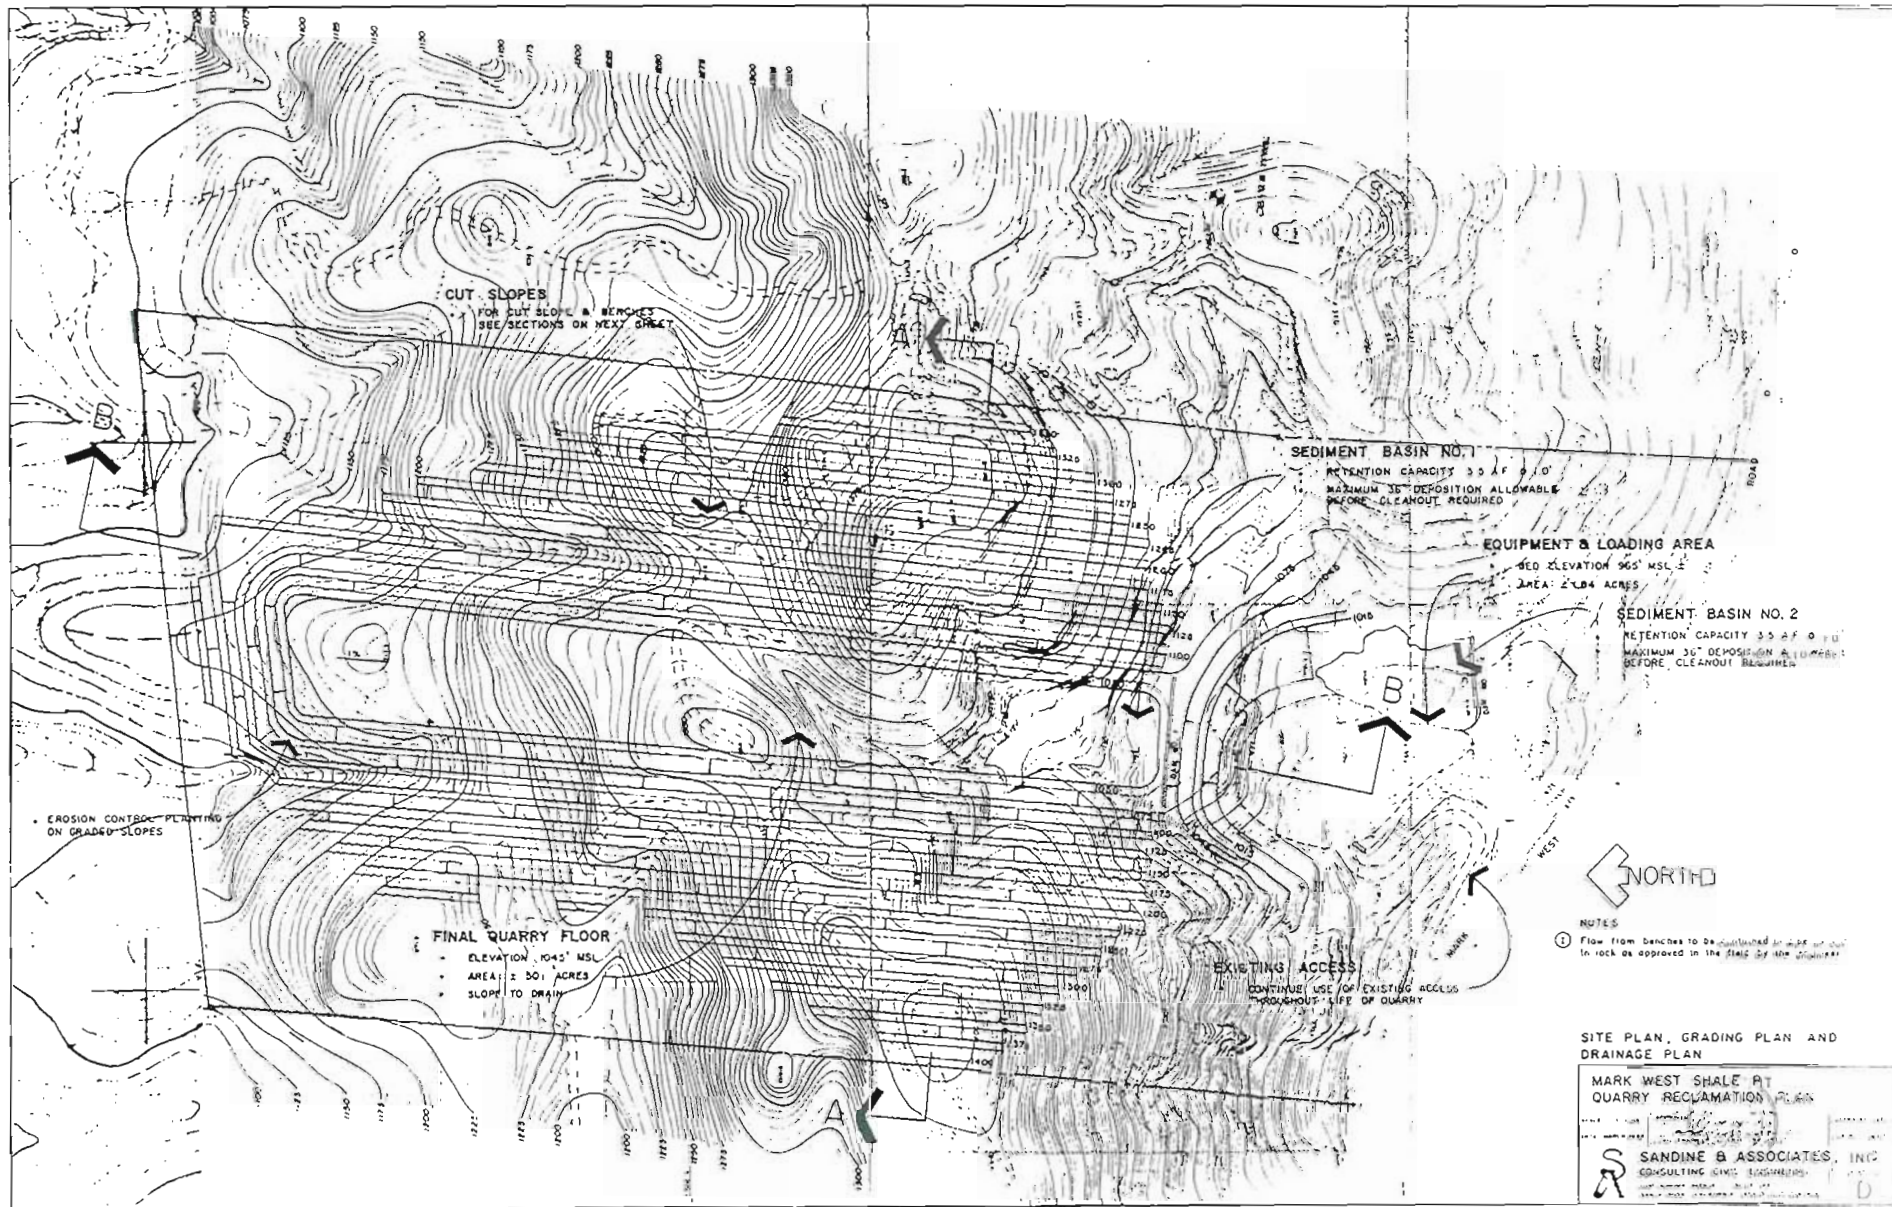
1988 RECLAMATION PLAN - GRADING AND DRAINAGE
